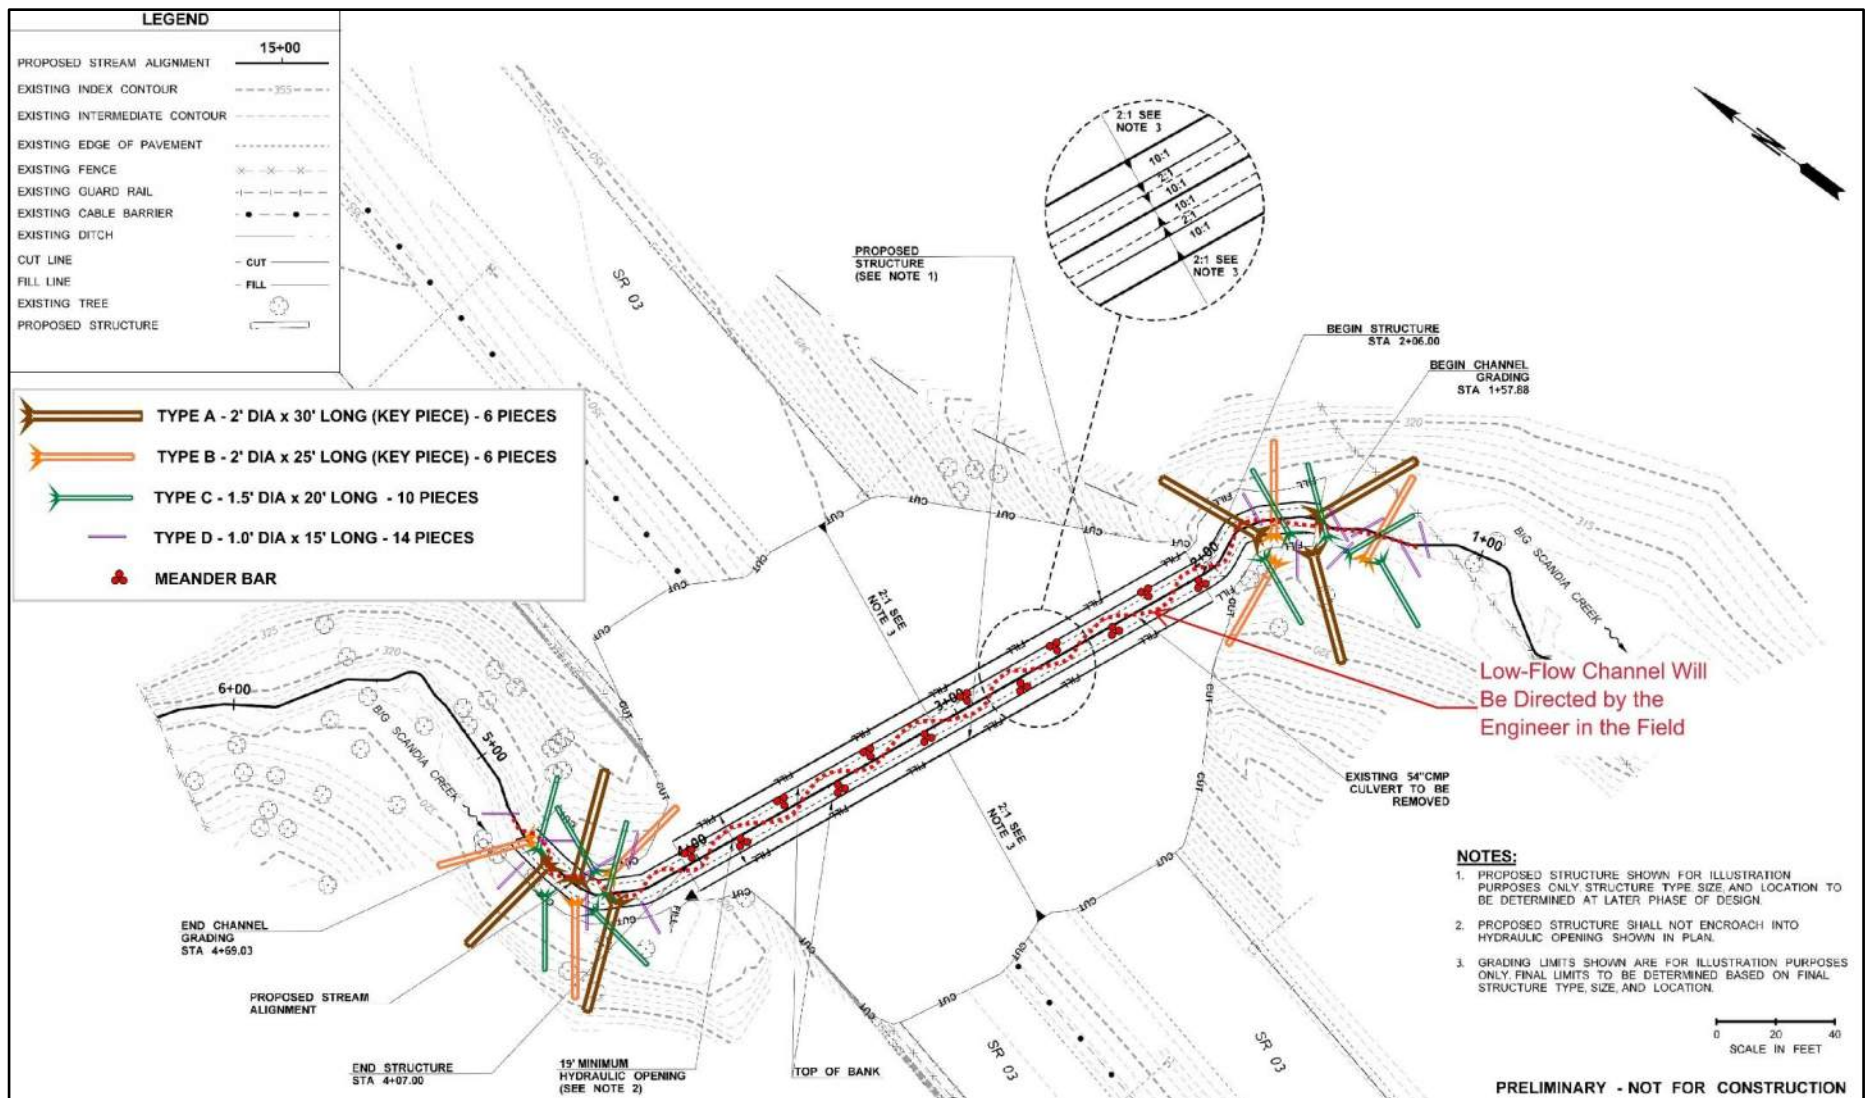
Conceptual layout of habitat complexity (Assumption structure type – Culvert)
